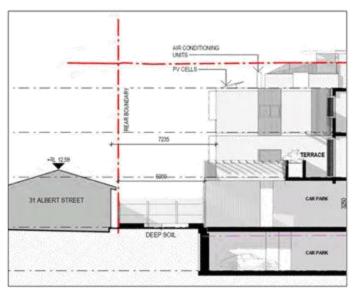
Section extract demonstrating compliant building height at the rear most plane
